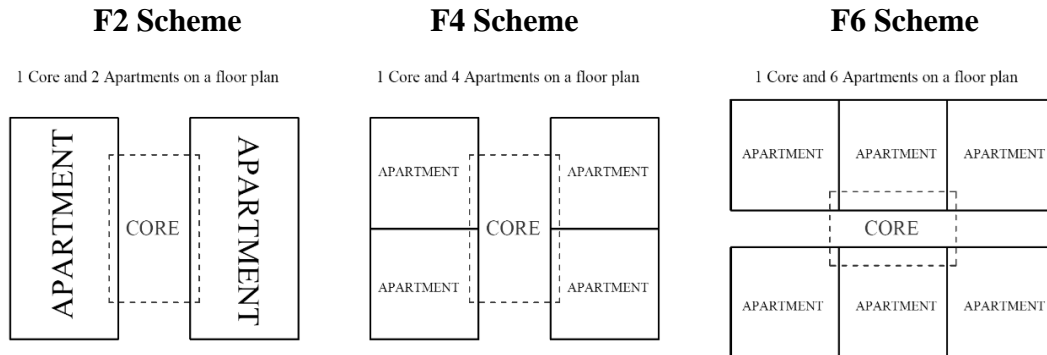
Number of Apartments on Floor Plan at TOKI Blocks
